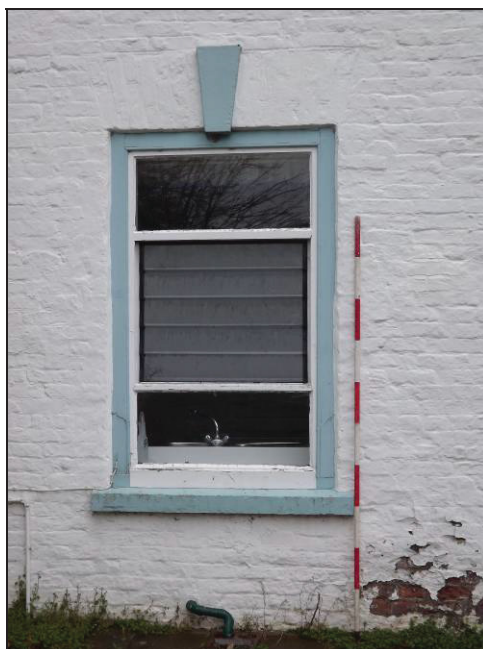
Detail of original ground floor window, north elevation (Scale = 2m)
